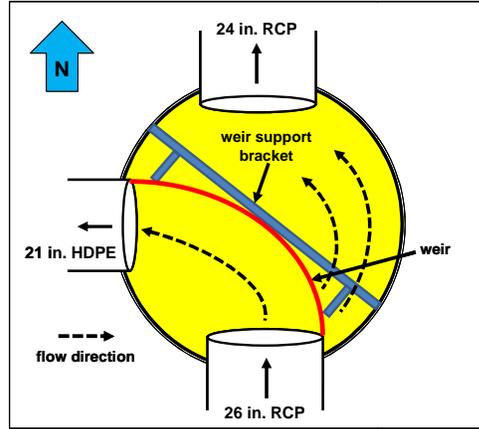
Manhole 376-203. Schematic plan view of diversion weir.
